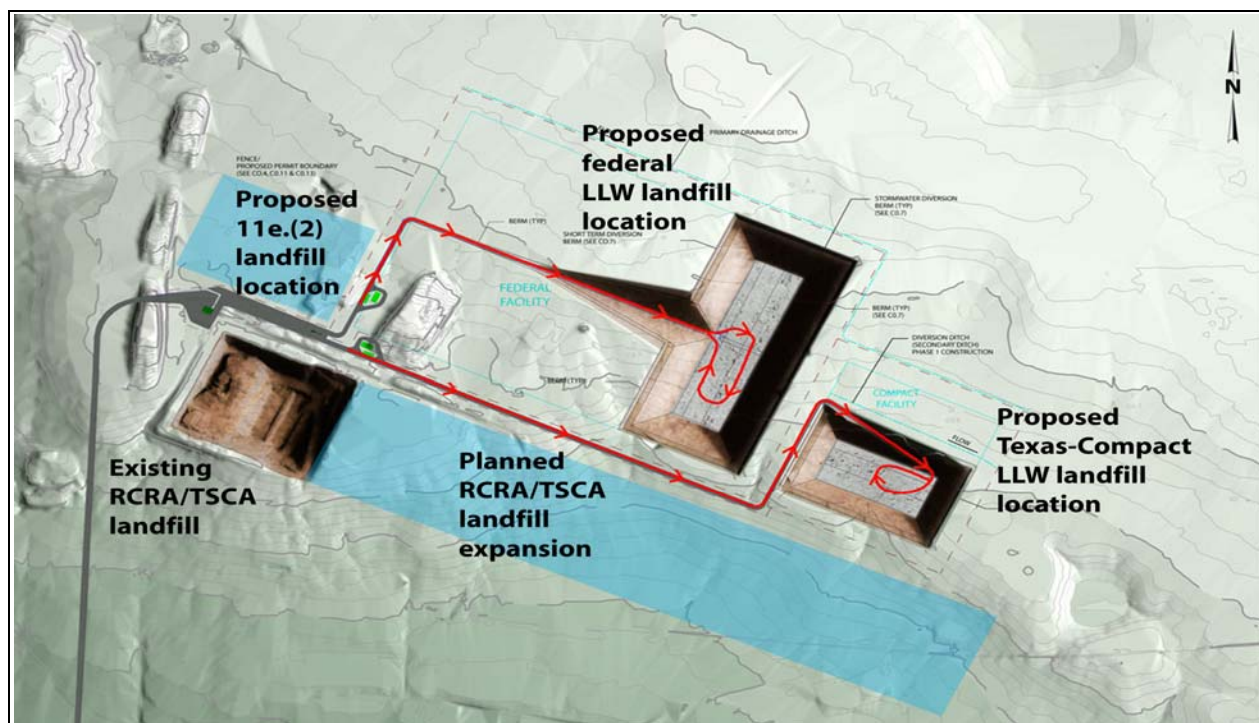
Schematic illustration of existing and planned disposal facilities/landfills at the WCS Andrews County site.
